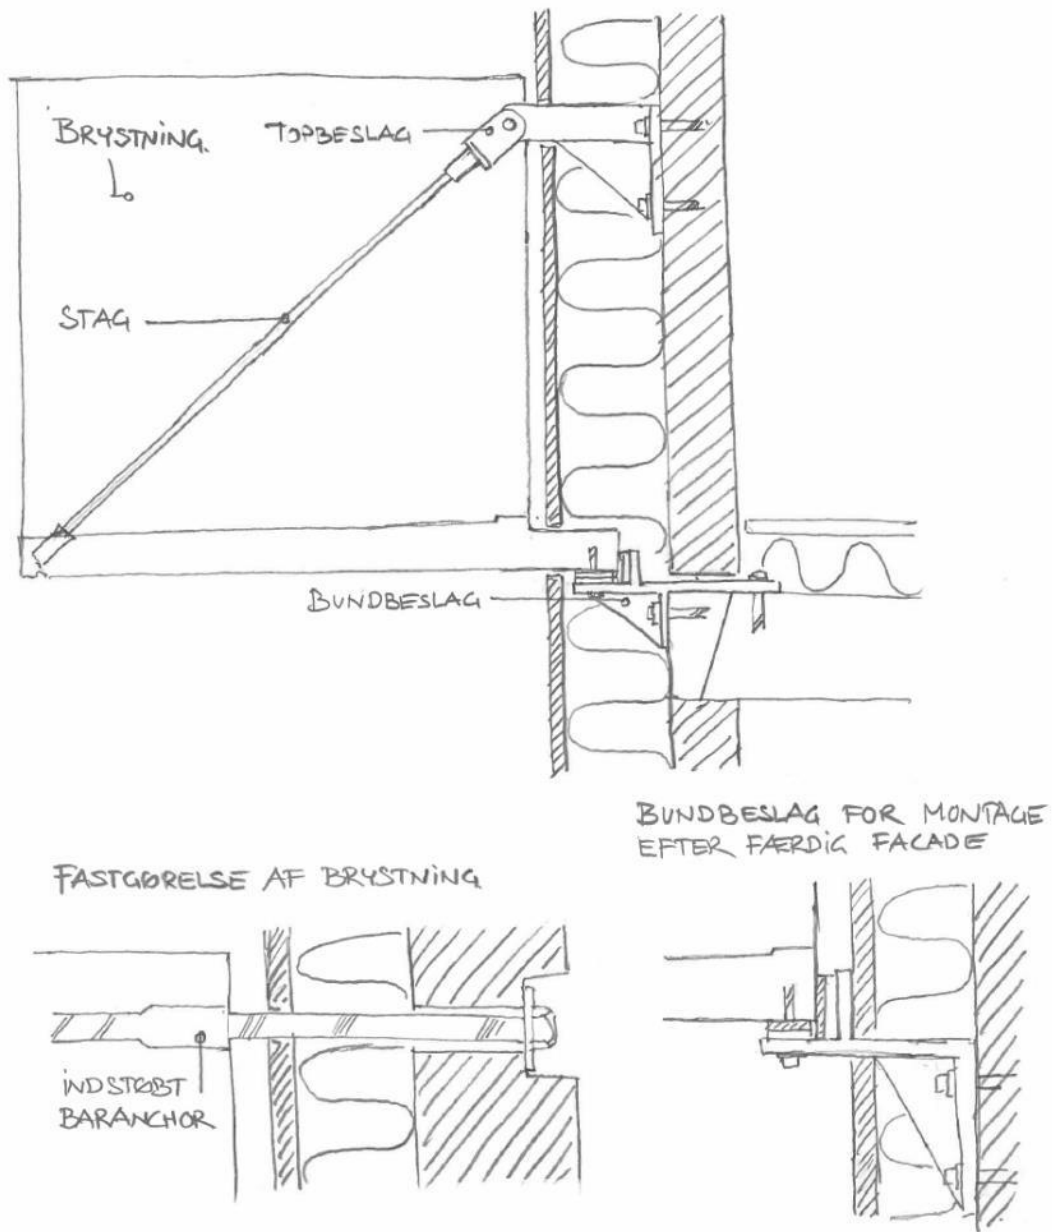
Connection details of balcony with struts or concrete upstand such as shown in fig. 2.
